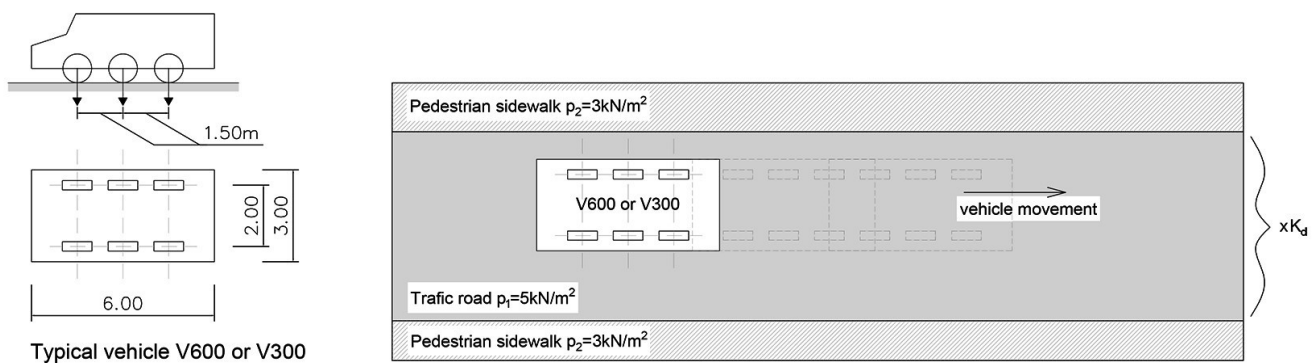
Scheme of a typical vehicle type V600/300, with loading scheme on the traffic road and sidewalk used for numerical analysis.
